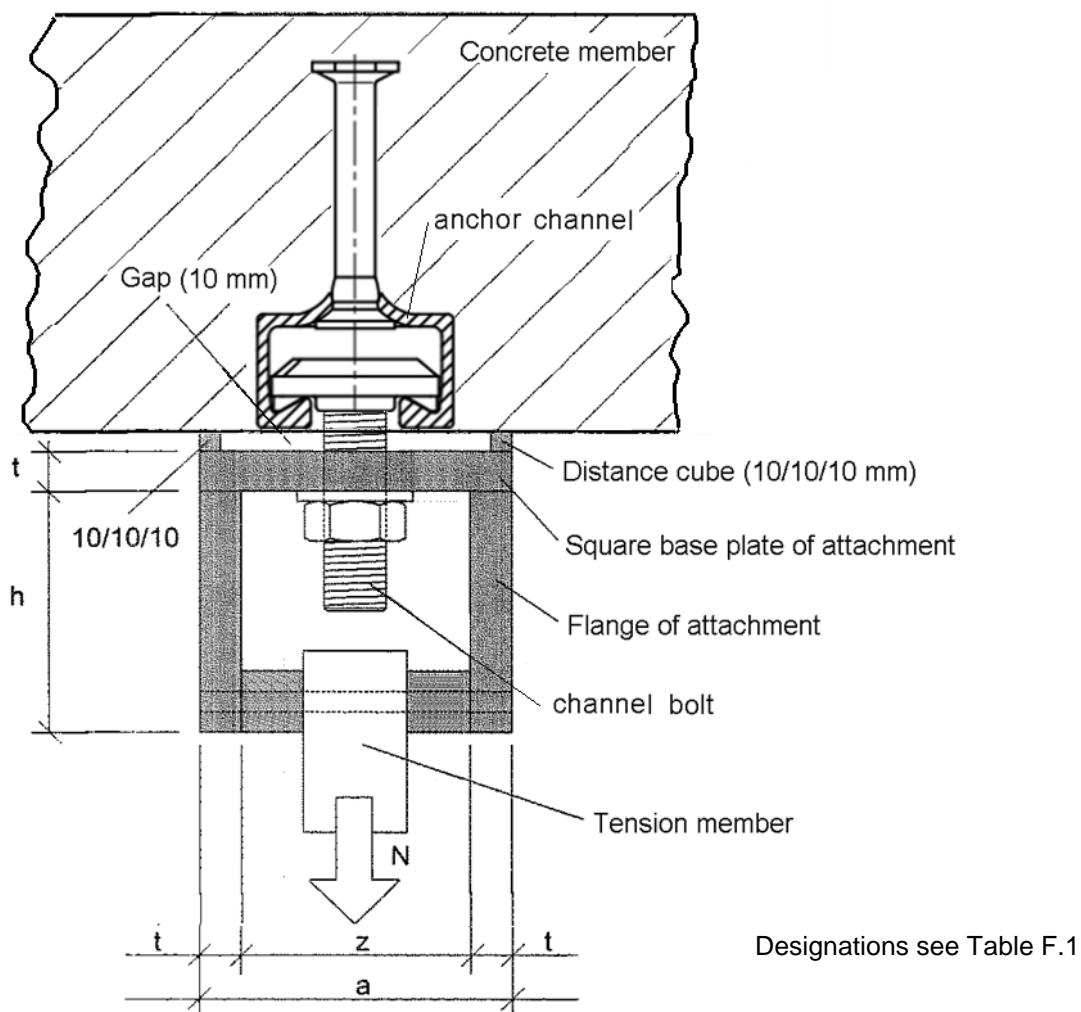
Test setup for the determination of the steel failure under fire exposure and tension load
